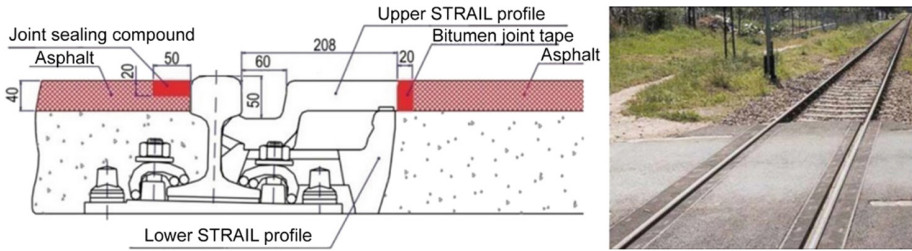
The example of STRAIL solution for level crossing (rubber element between rail and asphalt pavement): cross section (left) and installed crossing (right) [2].
